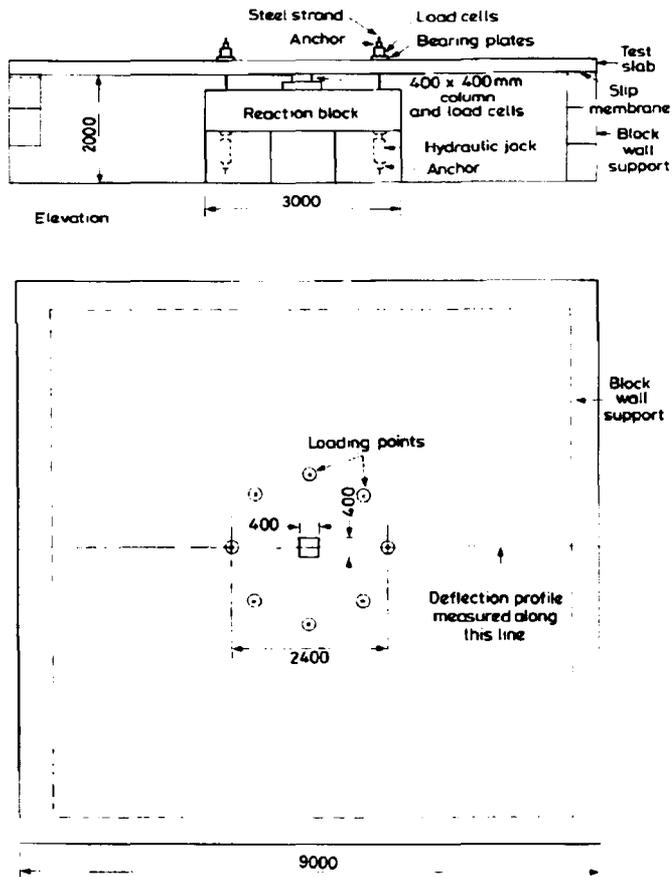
Schematic of Test arrangements (Chana & Desai, 1992)
